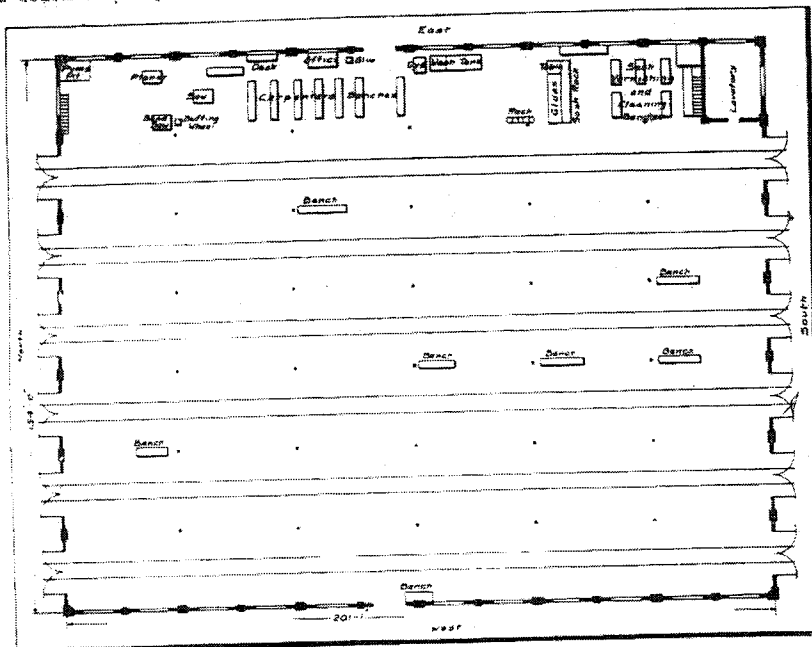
Interior Layout and Machine Distribution in Passenger Car Shop.
